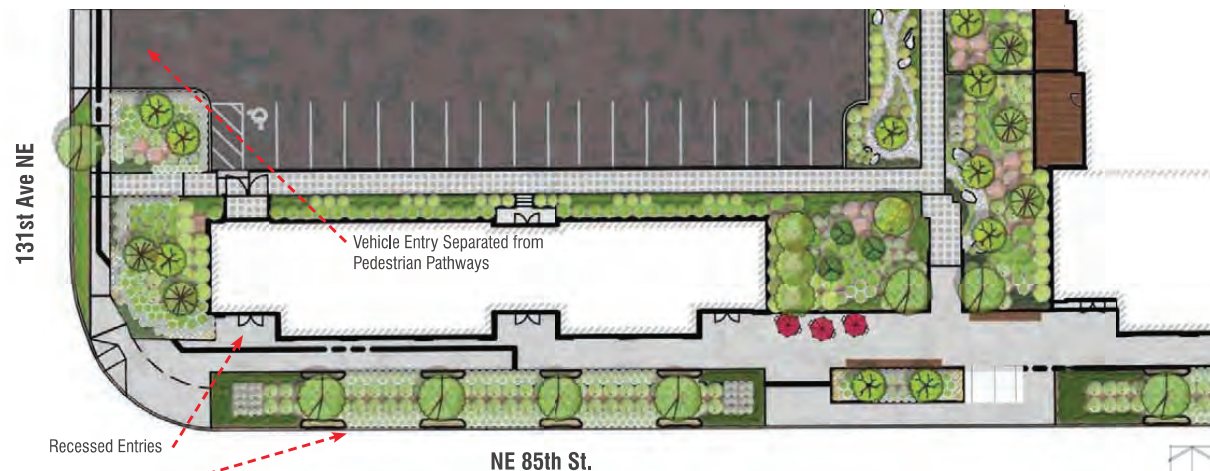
High-traffic streets without on-street parking warrant wider planting strip buffers.
